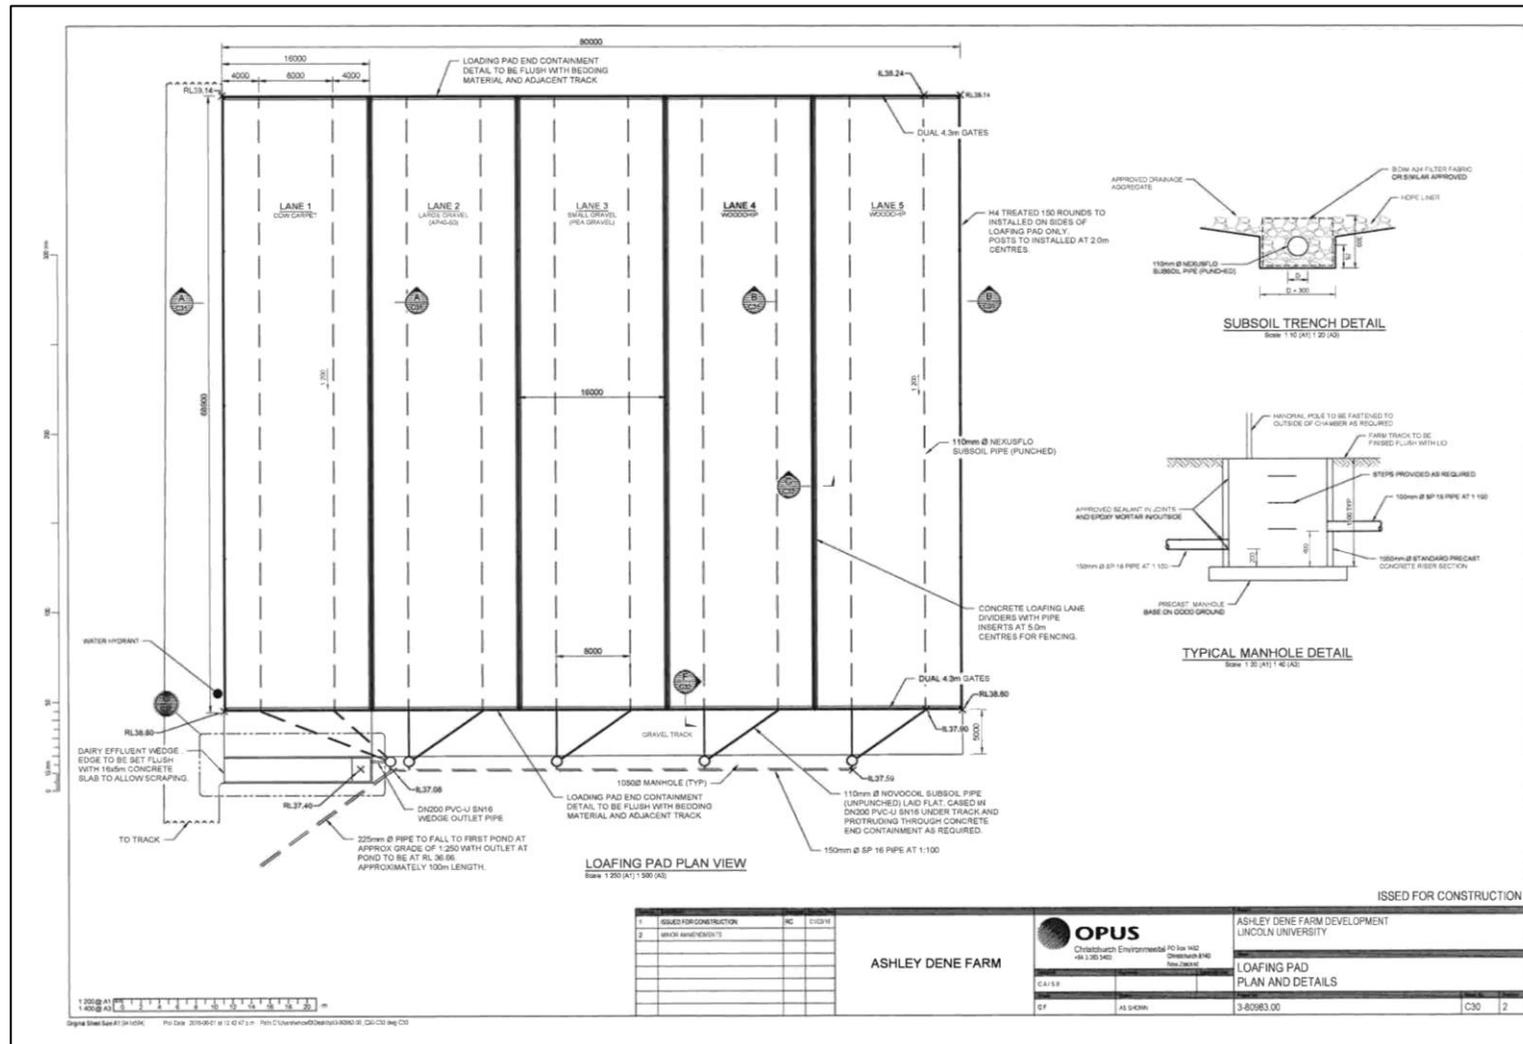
Birds eye view of the stand-off pad site with construction detail.
